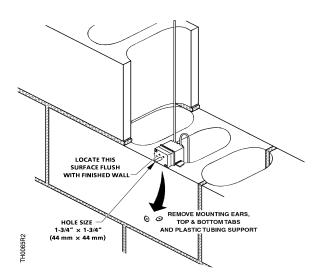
In Block Walls Use Wall Box Kit 192-478 or 192-480.
